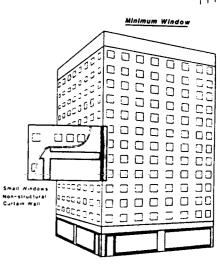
Framed Construction — Light Clad, Venting Type.
